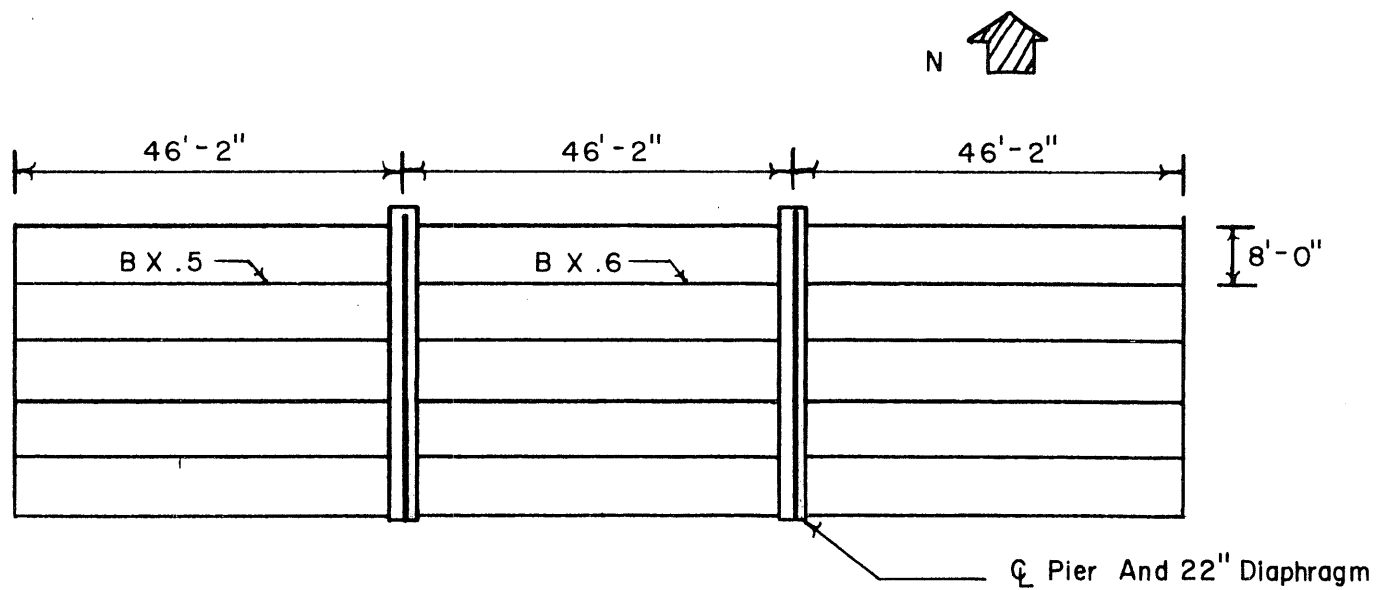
Plan of Bridge Showing Girder and Diaphragm Placement,
